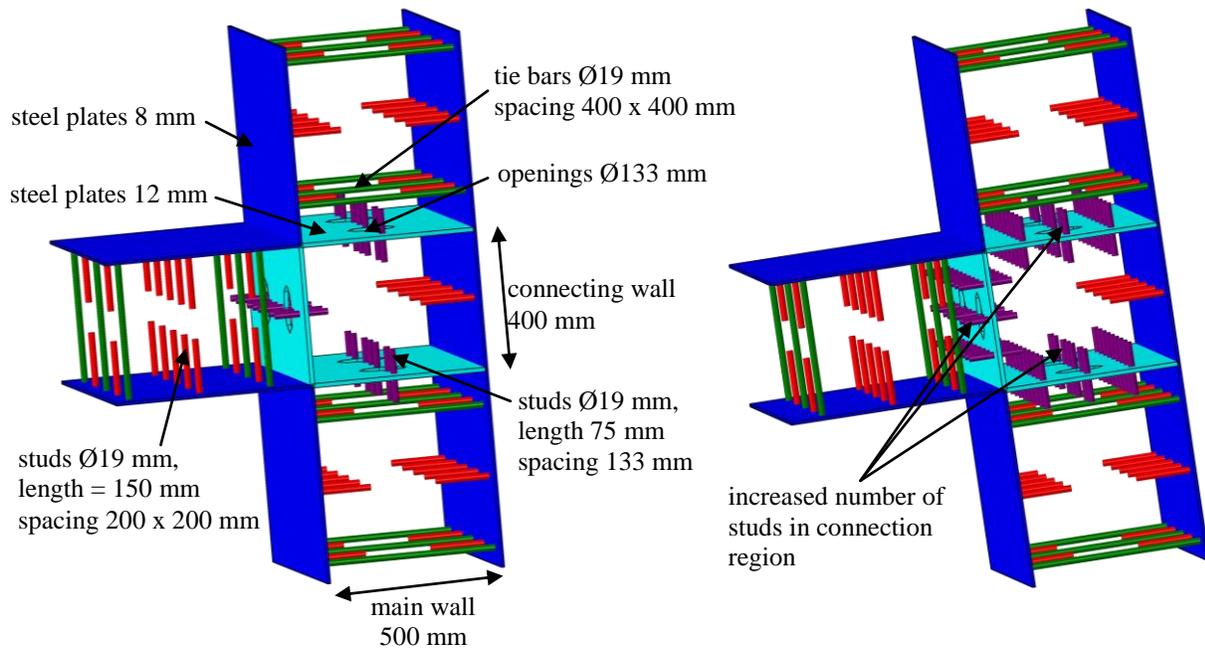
Wall to wall connection type I (left) and type II with increased number of studs (right)
